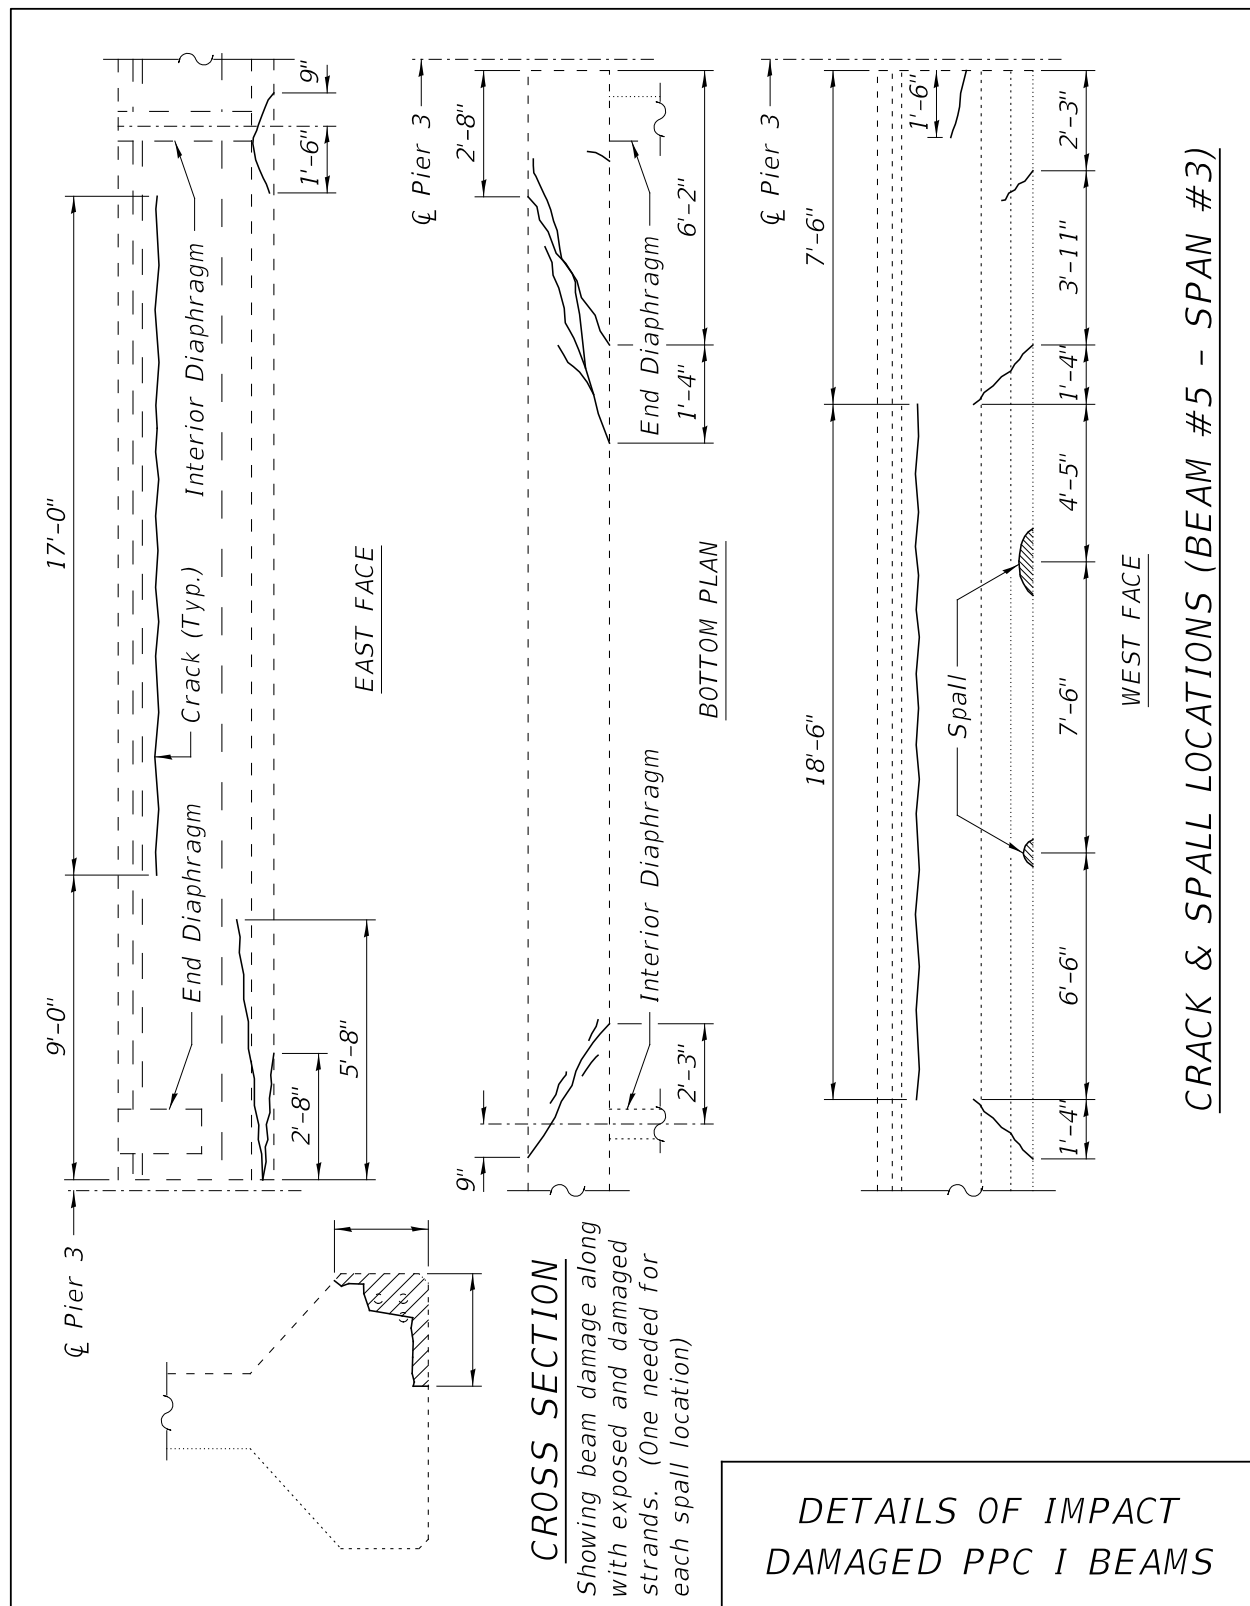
Details of Impact-Damaged PPC I-Beams
